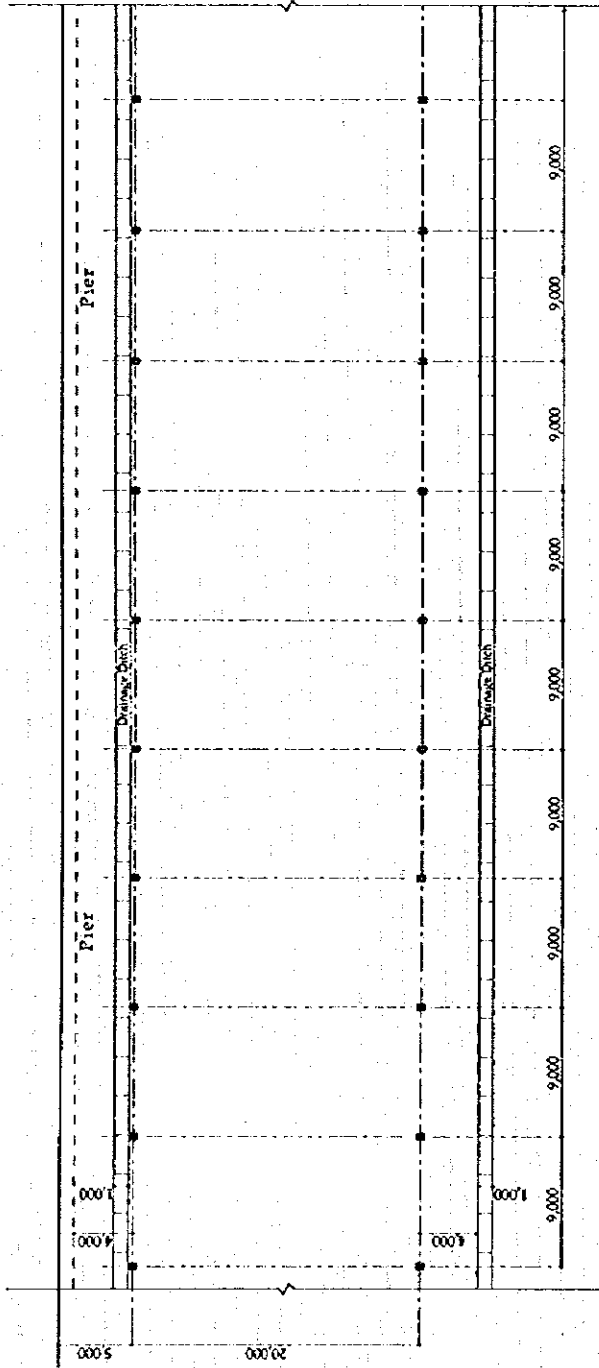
Detailed Layout Plan of Phuket Port
